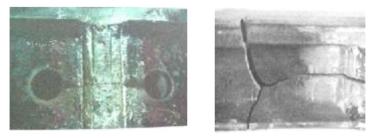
Welding, thermit joint horizontal crack
